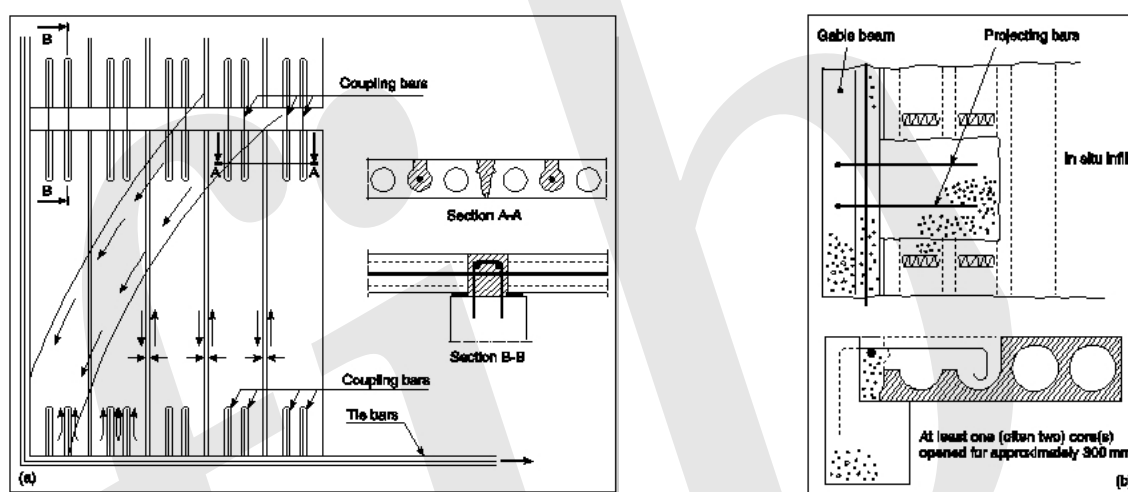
Examples of site fixed reinforcement in untopped hollowcore diaphragms (adapted from "Prefabrication with Concrete", Bruggeling and Huyge, Balkema Press, 1991).
